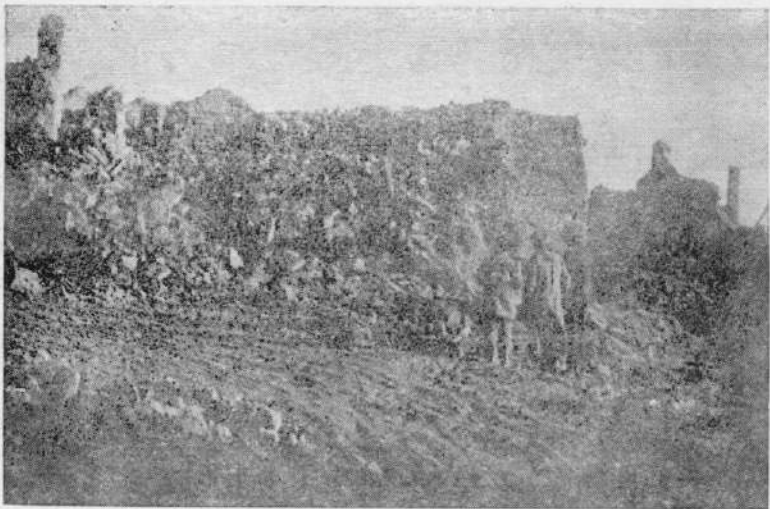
Destruction of adobe Houses at village Al-Olayb.
